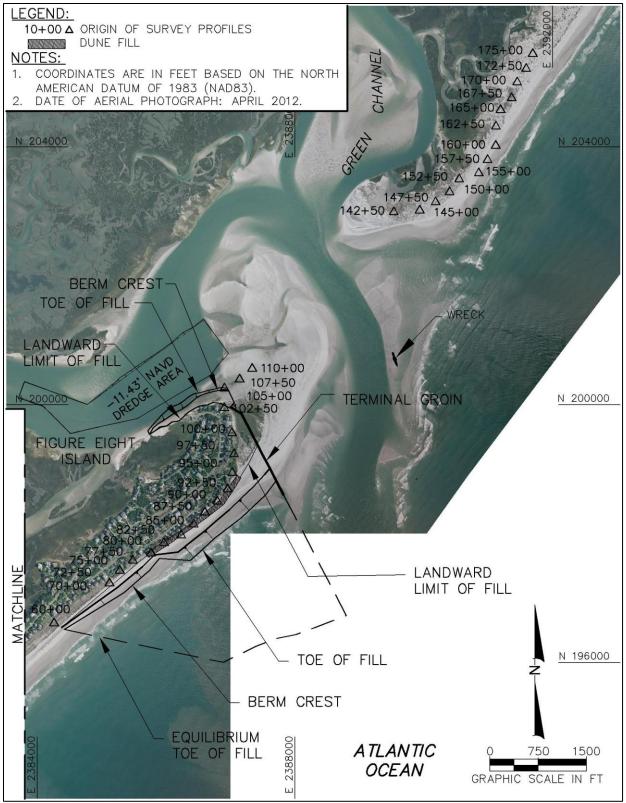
Plan View of Alternative 5B; 2012 shoreline conditions.
